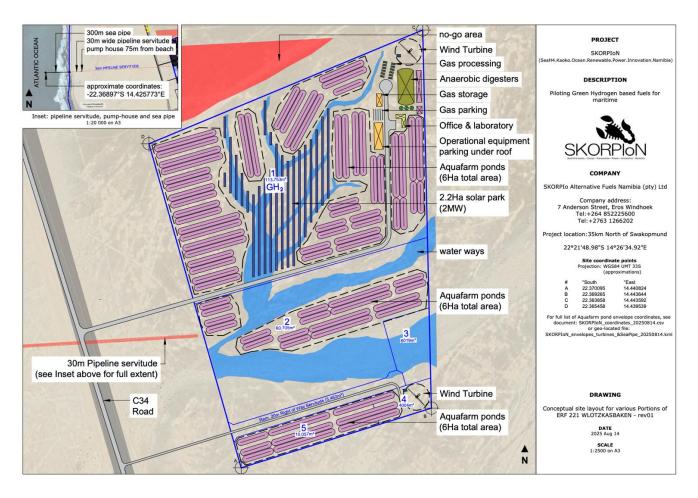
Proposed Seaweed Aquaculture Pilot Project Site Layout
